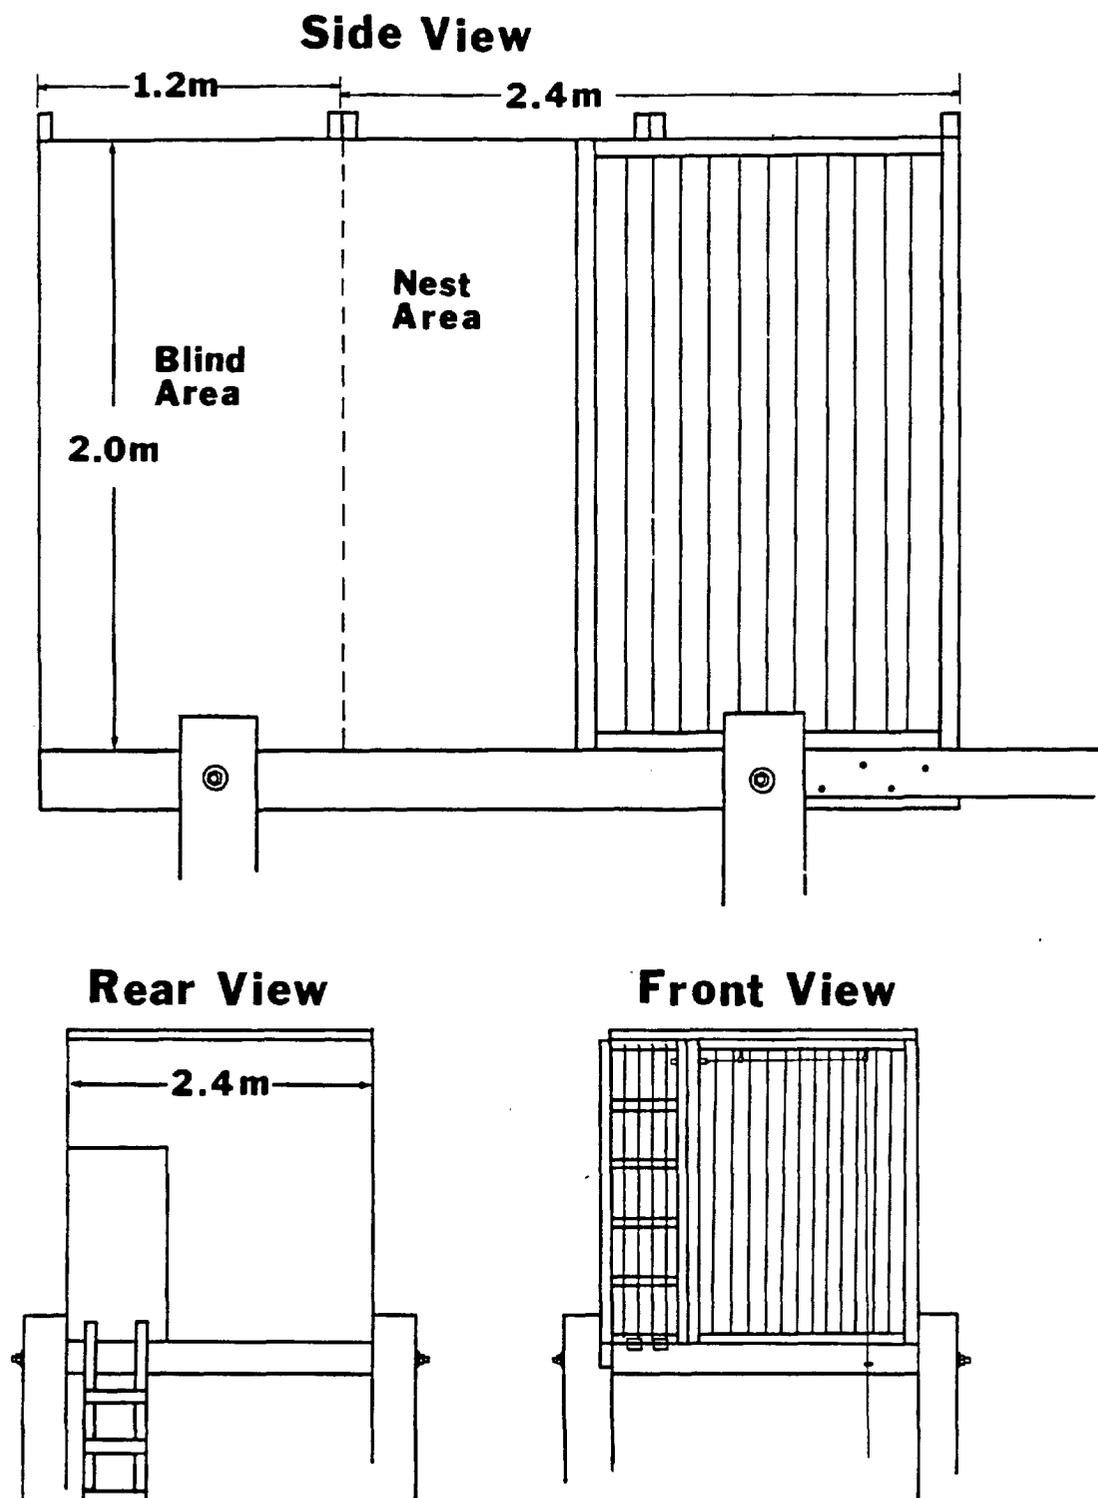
Views of a Hacking Platform: Side View, Showing Barred and Plywood (Solid) Portions of the Nest Area, and the Blind Area; Rear View, Showing Ladder Access to the Blind; and Front View, Showing Release Door (Left Side) and Bars.
